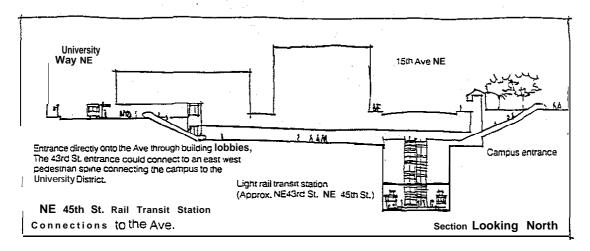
/)-22: Cross Section Through 15th Avenue NE ///strafing Light Rail Station Alignment
